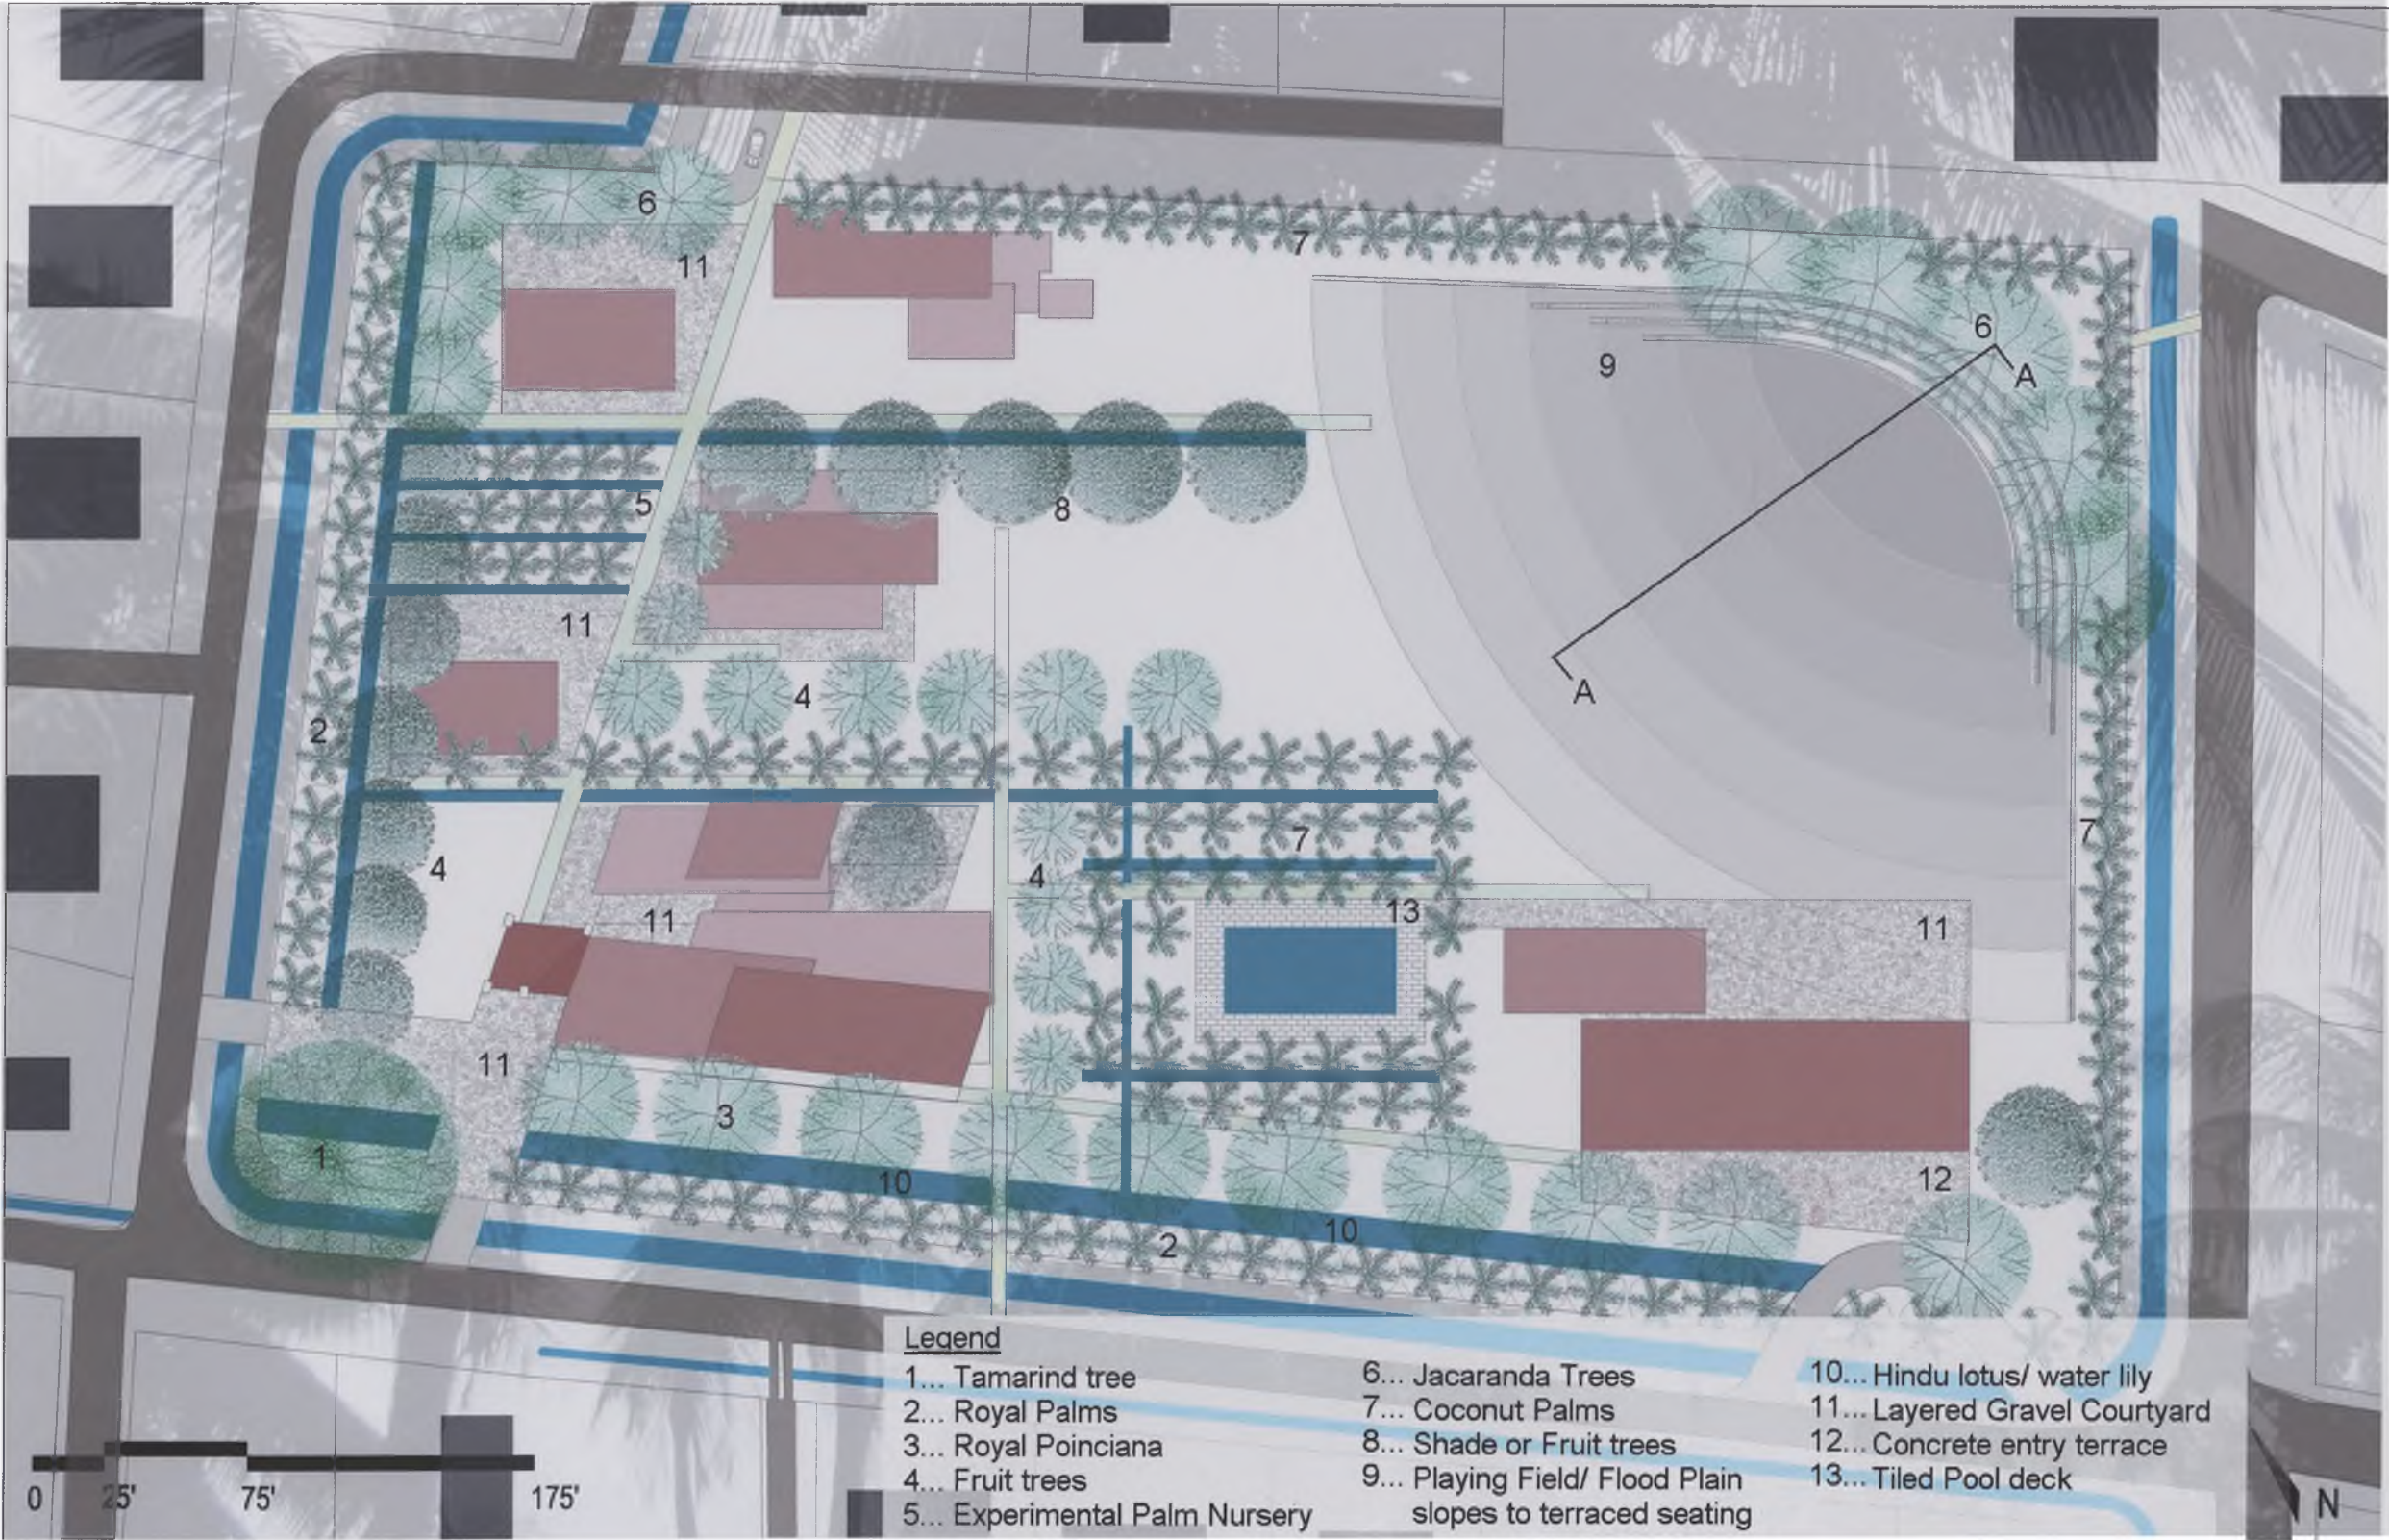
Roof Plan and Landscape Diagram showing landscaping, courtyard spaces, paths and water channels.
